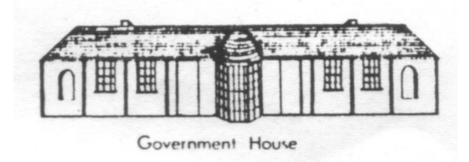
The only elevation of the Government House, showing elegant bay window with shingled cupola (Simpson's 1826 plan redrawn by Michael Pearson).
